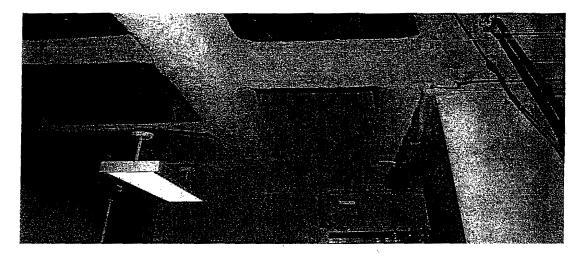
Yellowed Fireproofing, Intermediate Level Beam, 7TS5.
